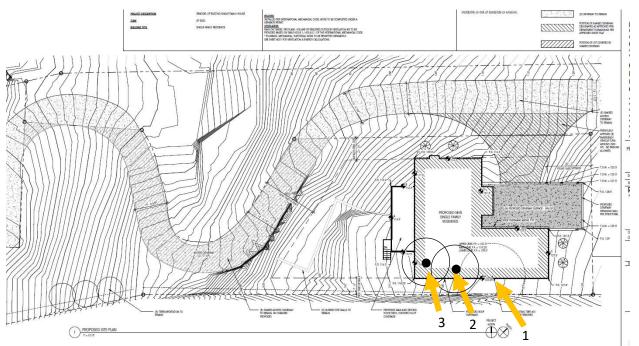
Site Plan: Kahn Spec Home (Brandt Design Group, 11/30/2020) with tree locations overlayed on the current development plans.
